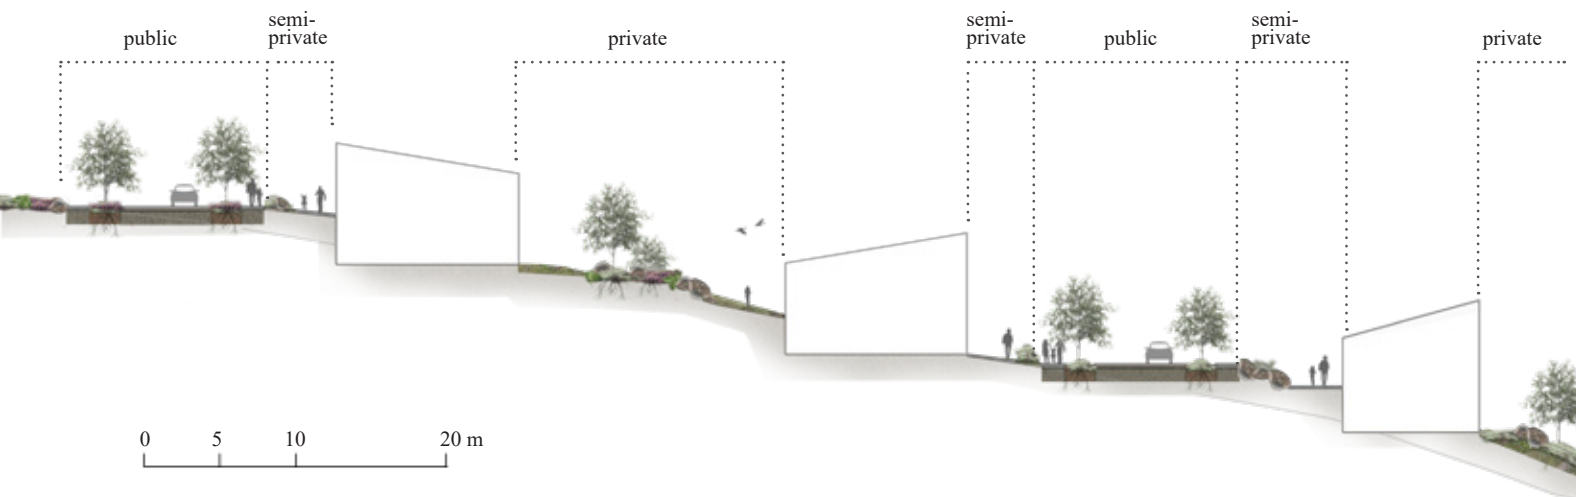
Section A-B 1:1000 (see section cut in fig. 45) showing the streetscape with plantbeds for surface water and how the buildings follow the landscape.
